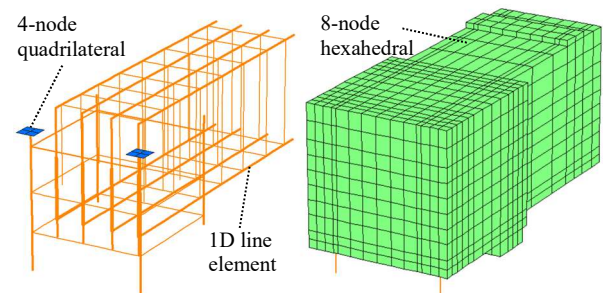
The 3D model of the beam-column joint specimen (LE25-M) developed in FINAL
